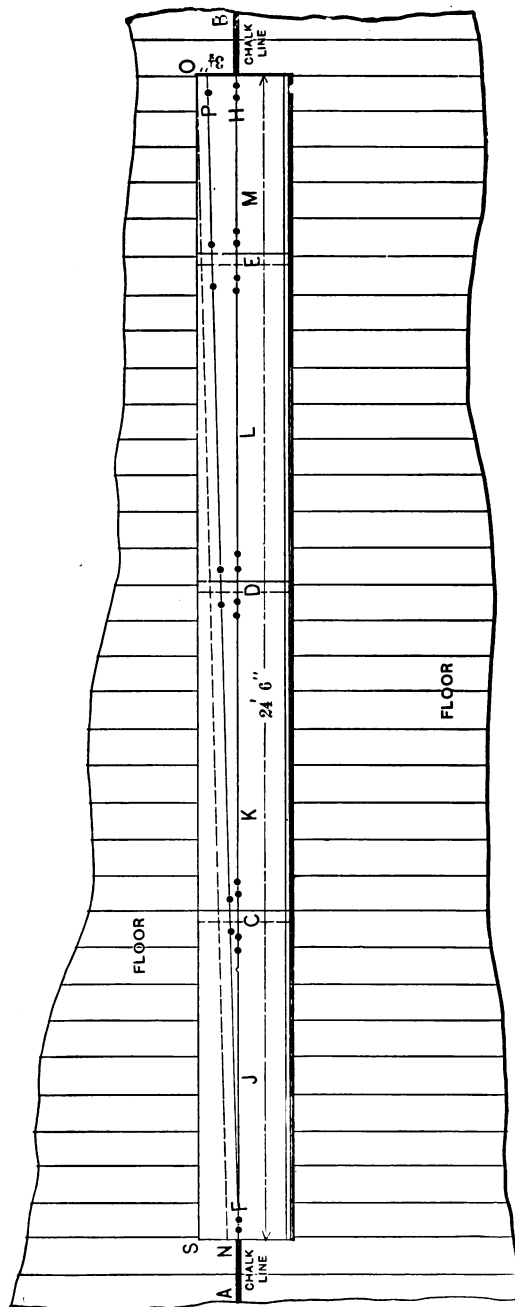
Method of Laying Out Gutter on the Floor to Obtain Pitch.
